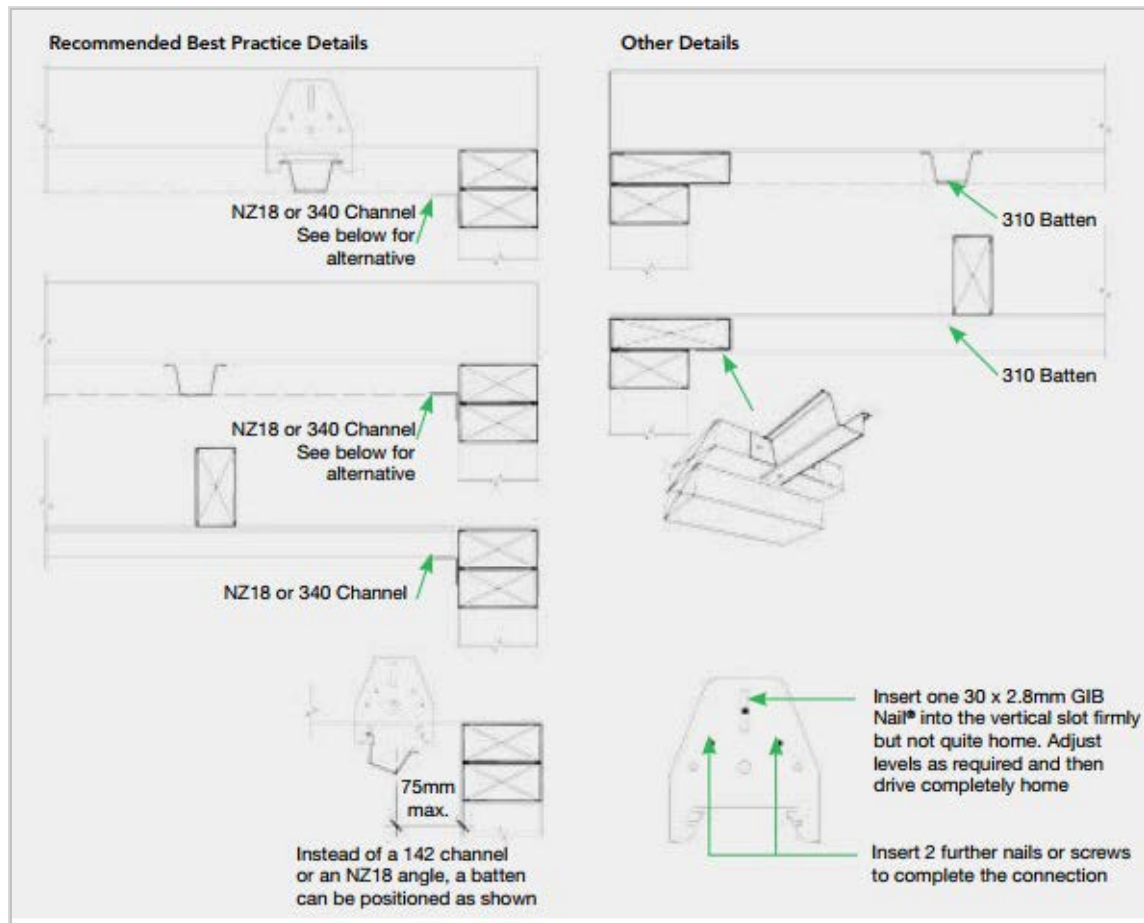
Common diaphragm construction practice (Winstone Wallboards, 2014).
